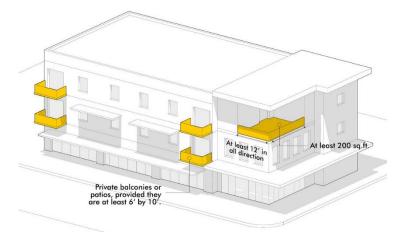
Private or Common Open Spaces Private or commons areas incorporated into the building can provide a portion of the useable on-lot open spaces. These elements can also meet design requirements for breaking up the massing or blank wall of buildings24-603.d.2.(c) and (d)
